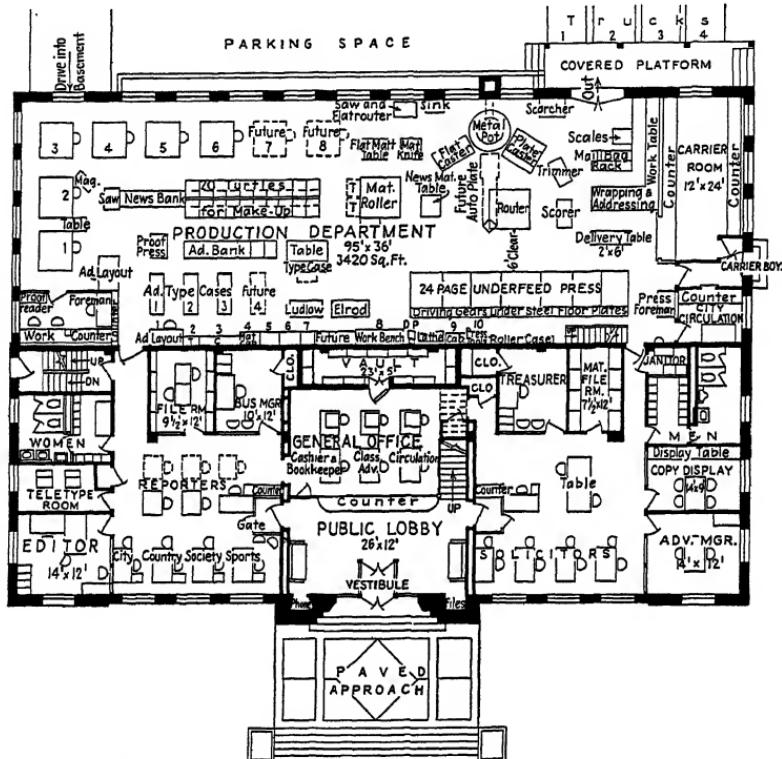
Main floor plan, Iowa City *Press-Citizen* plant. Note absence of obstructions in production department and accessibility of "front office" departments. (*Courtesy of Press-Citizen and Kruse & Klein, architects.*)
